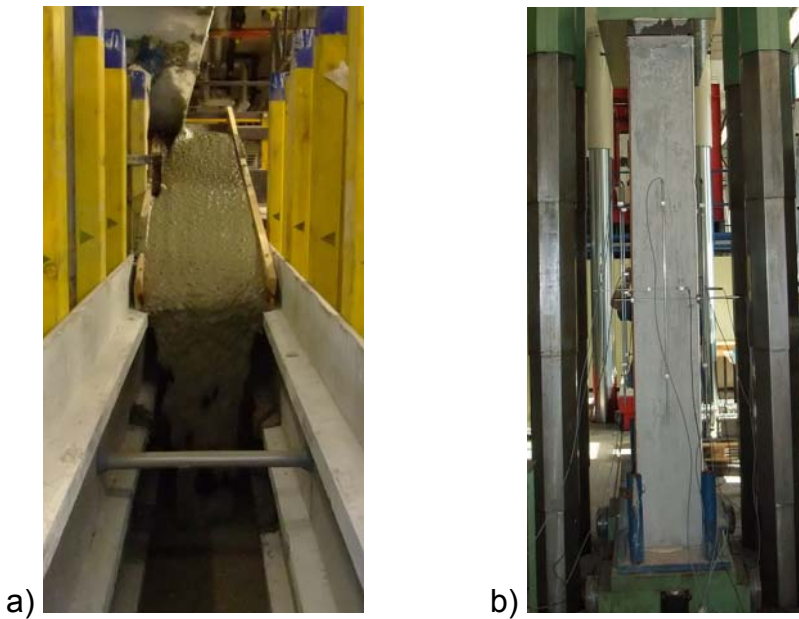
a) Concreting of a wall, b) Test set-up of centric compression test
